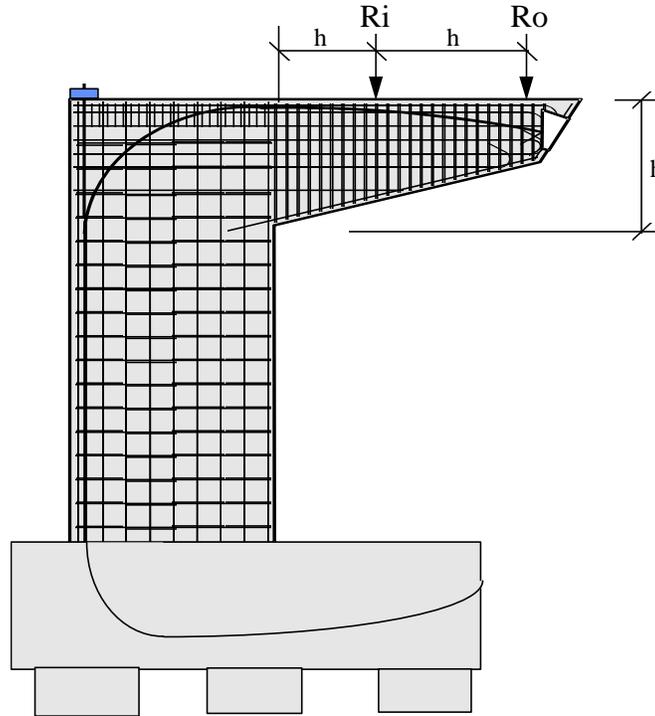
Fully prestressed overhang design with reinforced concrete pier
